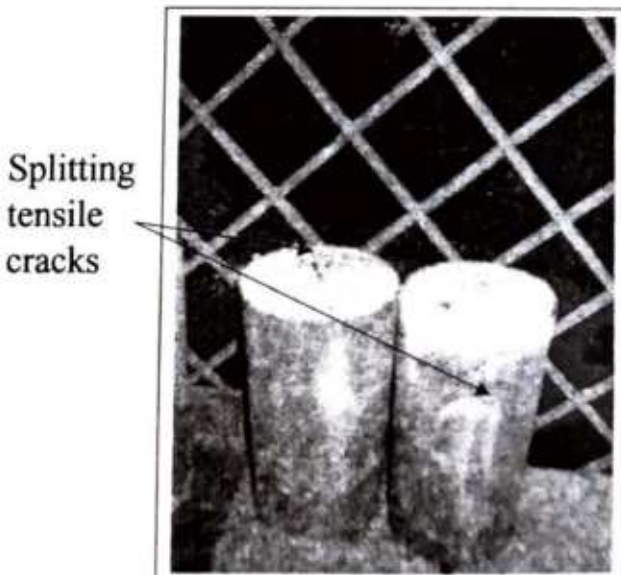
Concrete test cylinders containing coir fibers after splitting tensile test
